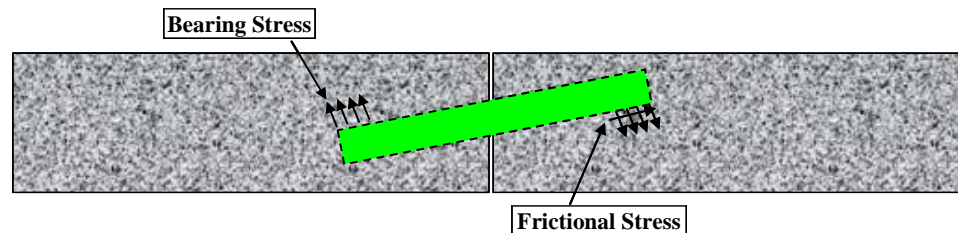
Misaligned dowel bar in a concrete pavement slab
